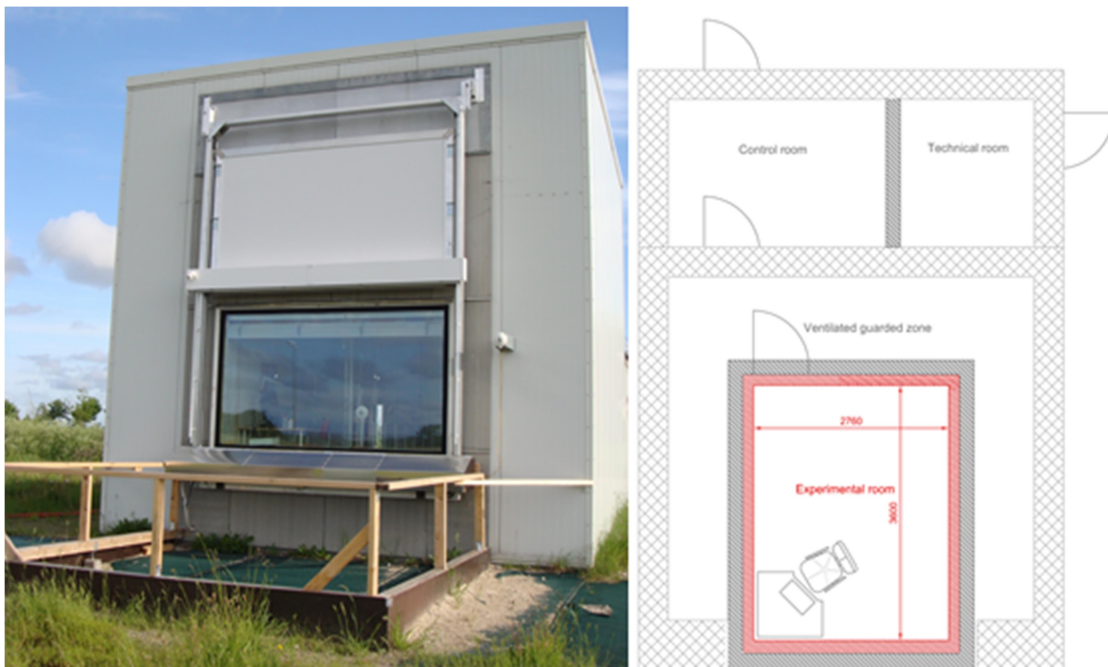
Photo of the facade of the Cube and a top view of the plan layout of the Cube and the experimental room.
